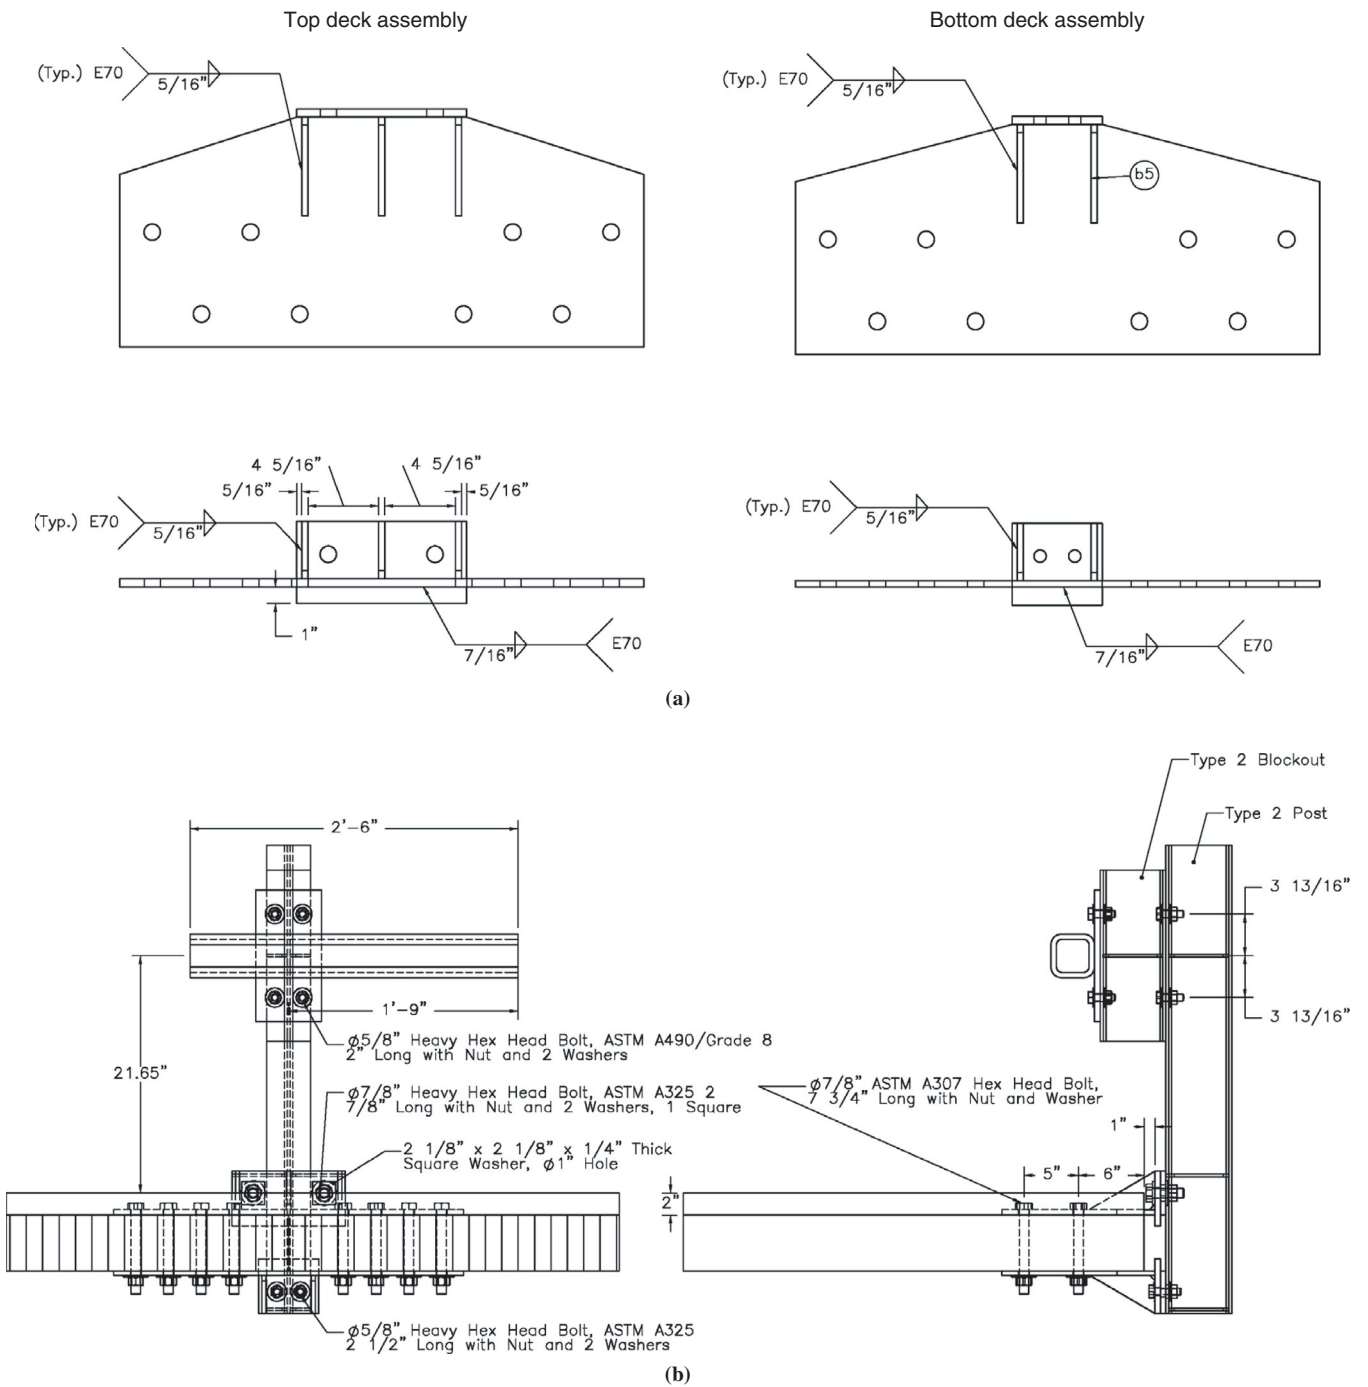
Drawings of (a) deck mounting plates and (b) dynamic post testing schematic (eccentric impact without shear connectors), both for TL-2 steel barrier.
